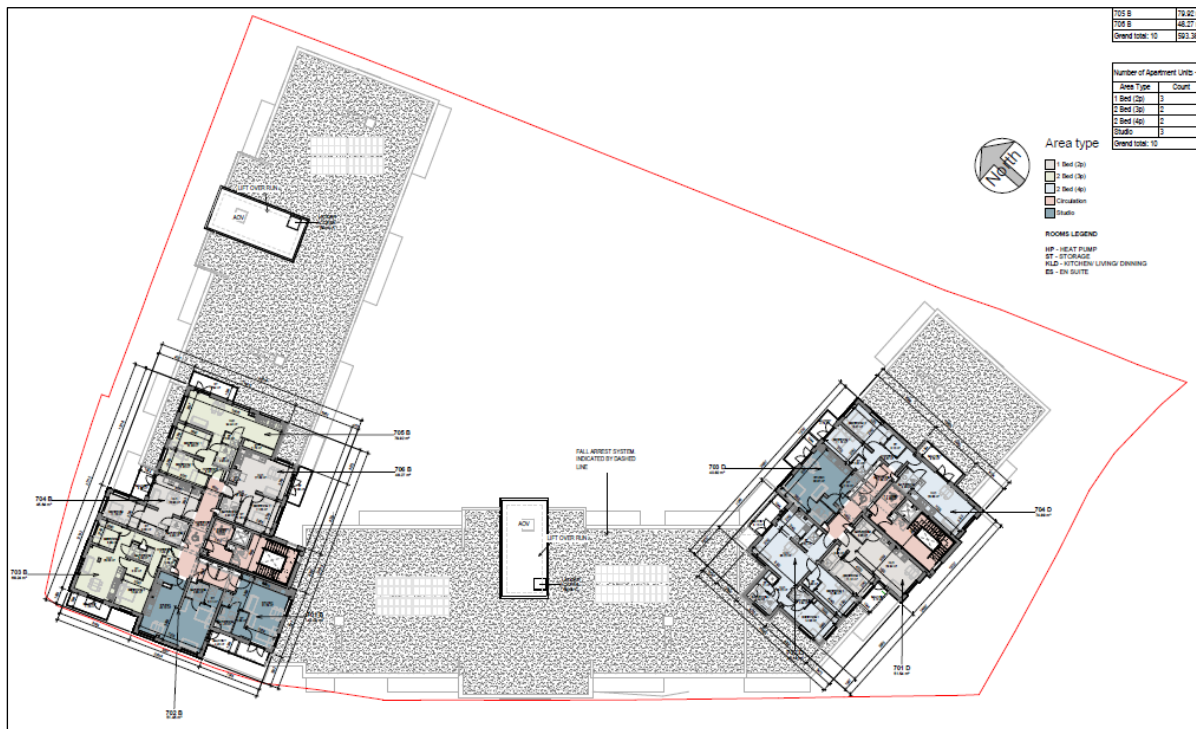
Seventh floor plan of proposed amended development under ABP Ref. ABP-307177-20
